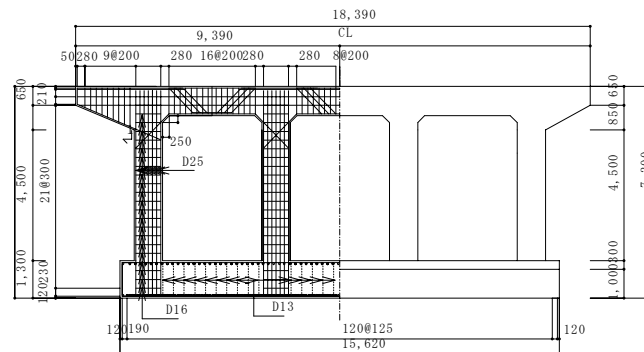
Re-designed reinforced concrete pier of a bridge (Okazaki, 2005)
